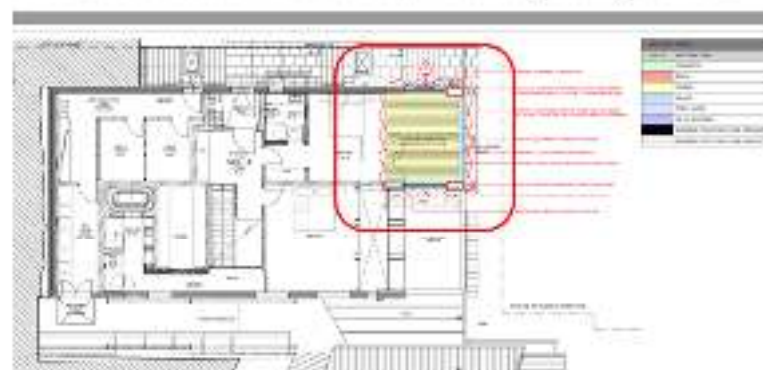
Floor plan (level 2), area in red indicates the proposed works (Source: Habitation Design & Interiors)
